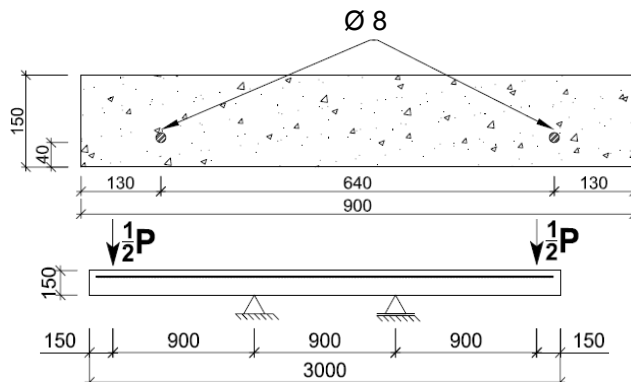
Cross section and test setup, large slab testing. Dimensions in mm. The slabs were turn up side down when tested so that it was possible to see the crack development
